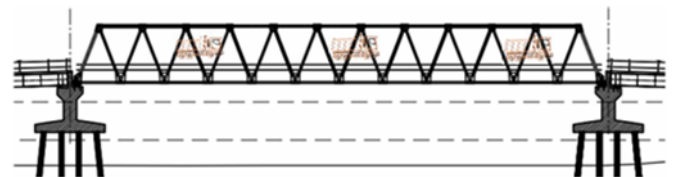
Illustration of a load of 3 trucks @ 10.5 tons on the steel truss bridge.
